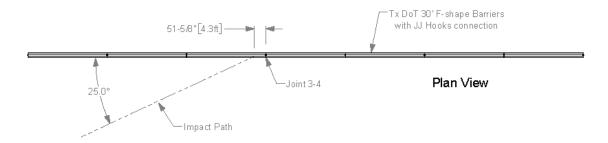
Target CIP for MASH TL-3 Test No. 440592-2 on Damaged Portable Concrete Barriers.
